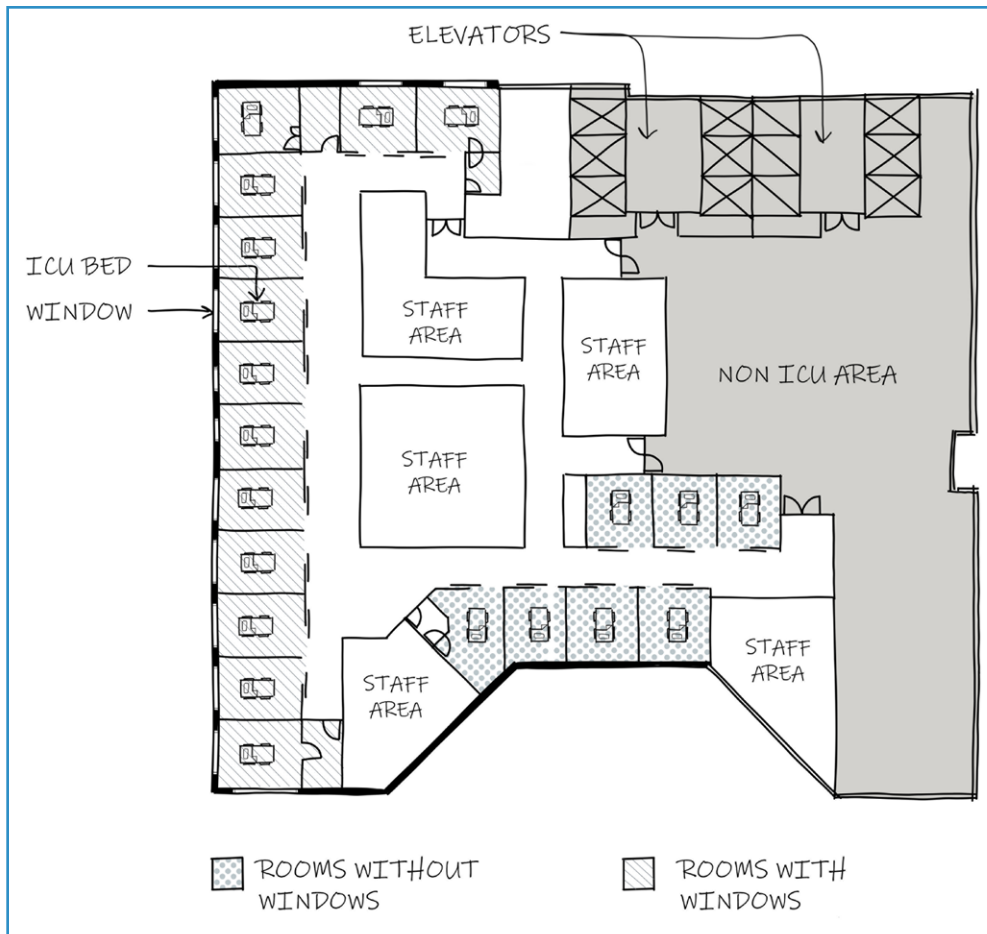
Floor plan sketch of the surgical ICU showing patient room types. Used with permission from S. Blanch.
